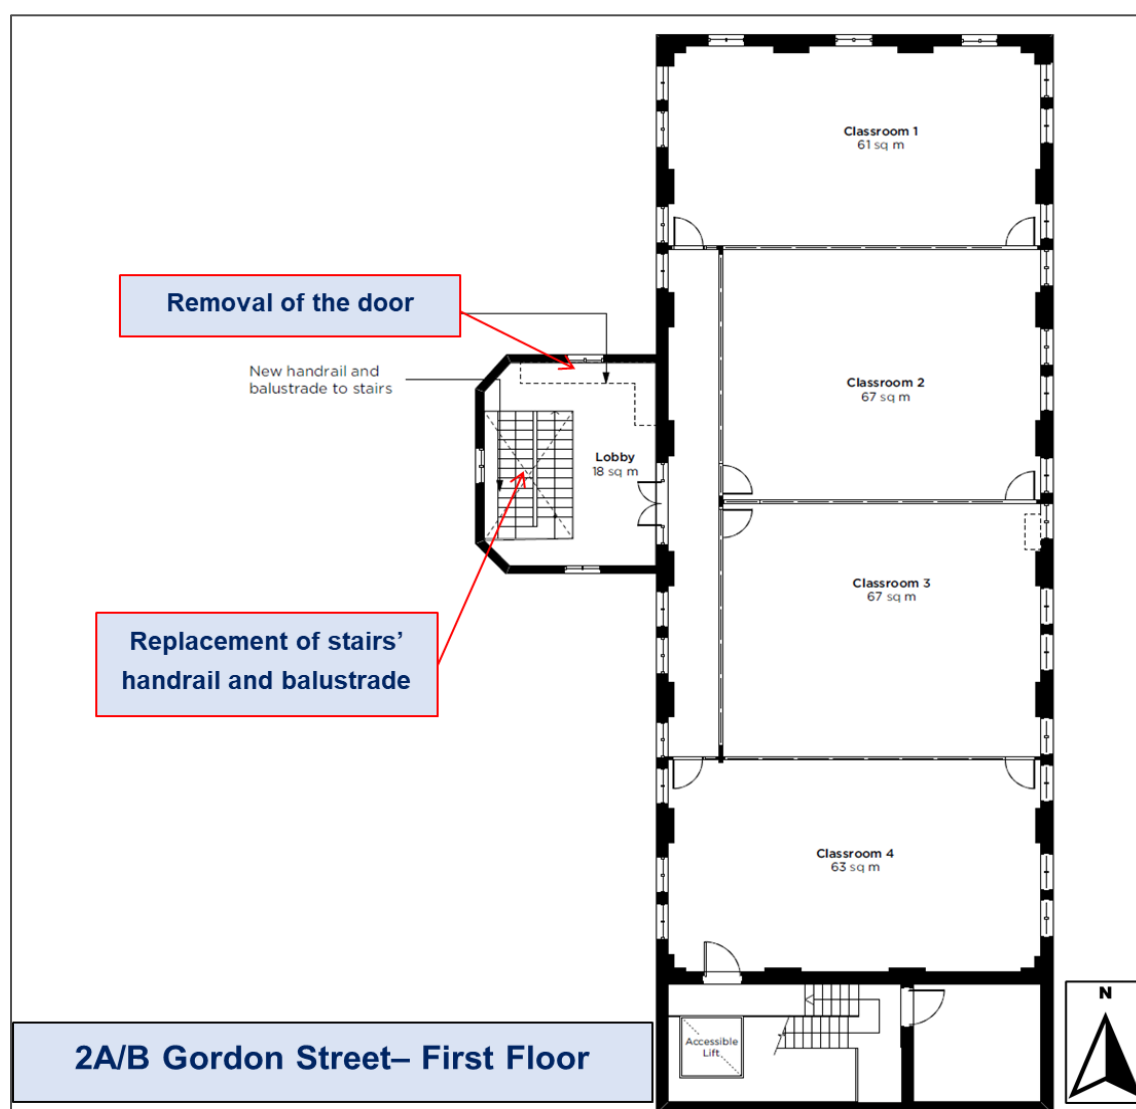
| Proposed works - Gordon Street site (Source: Applicant's RtS 2022)
